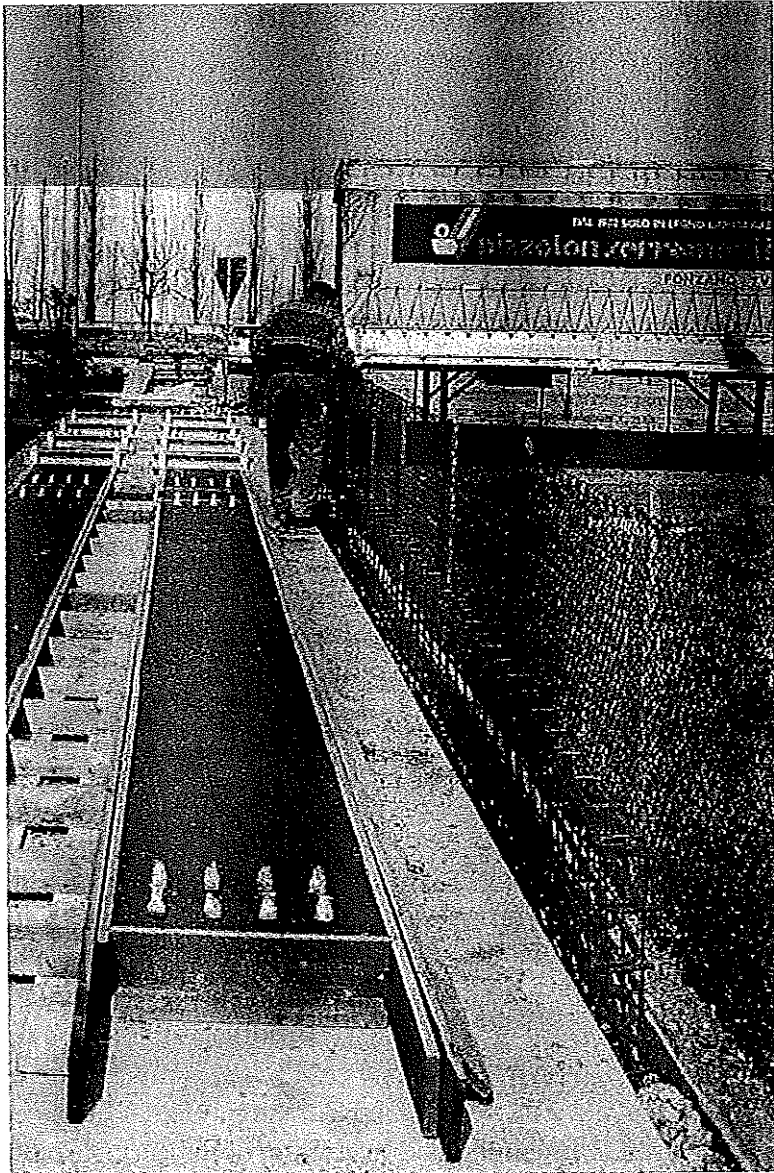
Field tests on restrained drying shrinkage of concrete slabs 8 m long, 400 mm wide and 60 mm thick (8.75-yd long, 16-in wide and 2.3-in thick).
